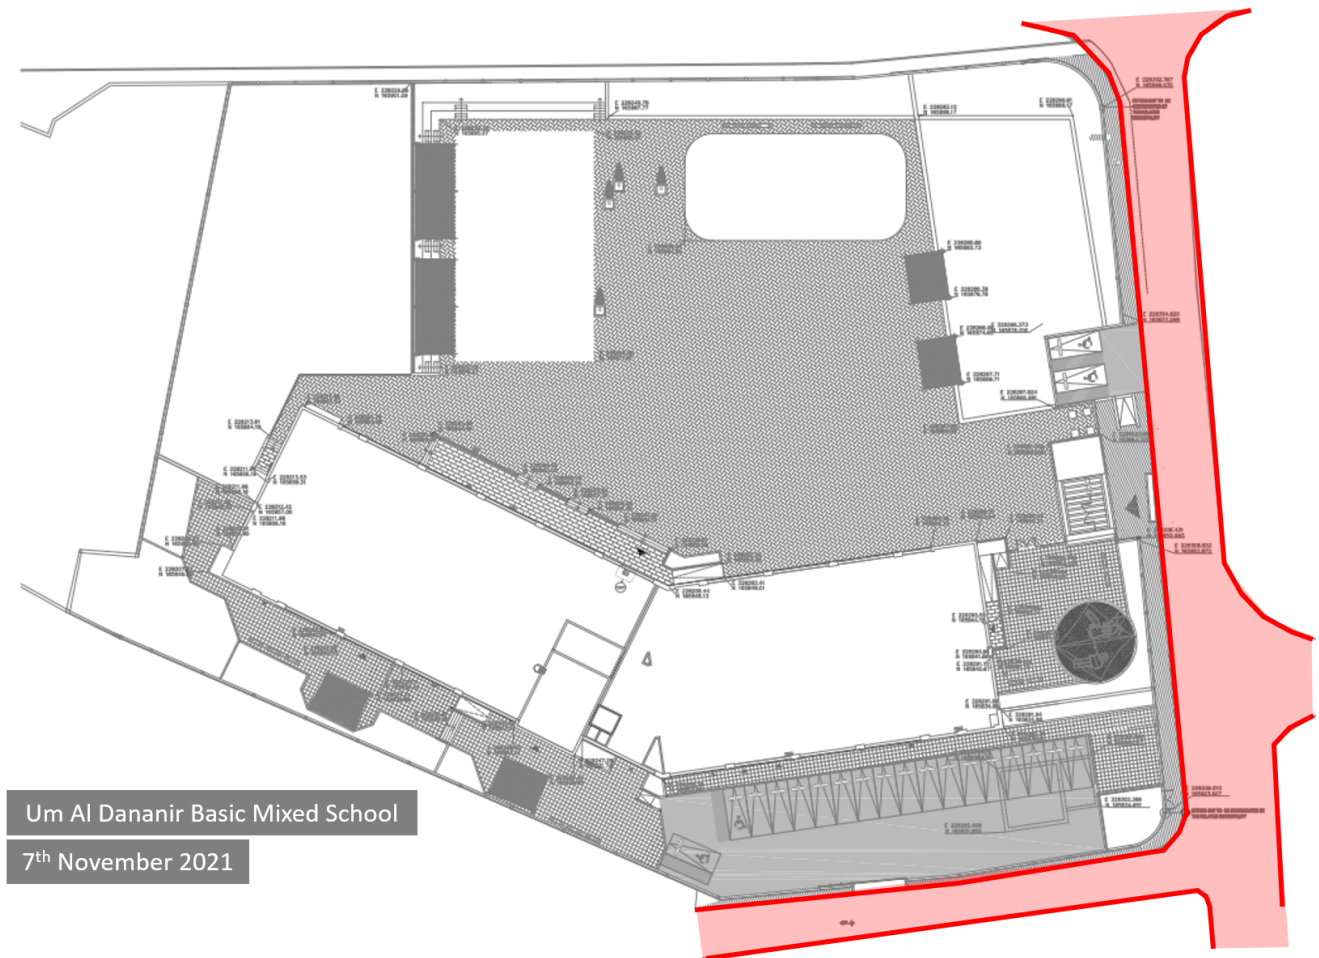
The problem has been solved and a modified site plan drawings were issued
